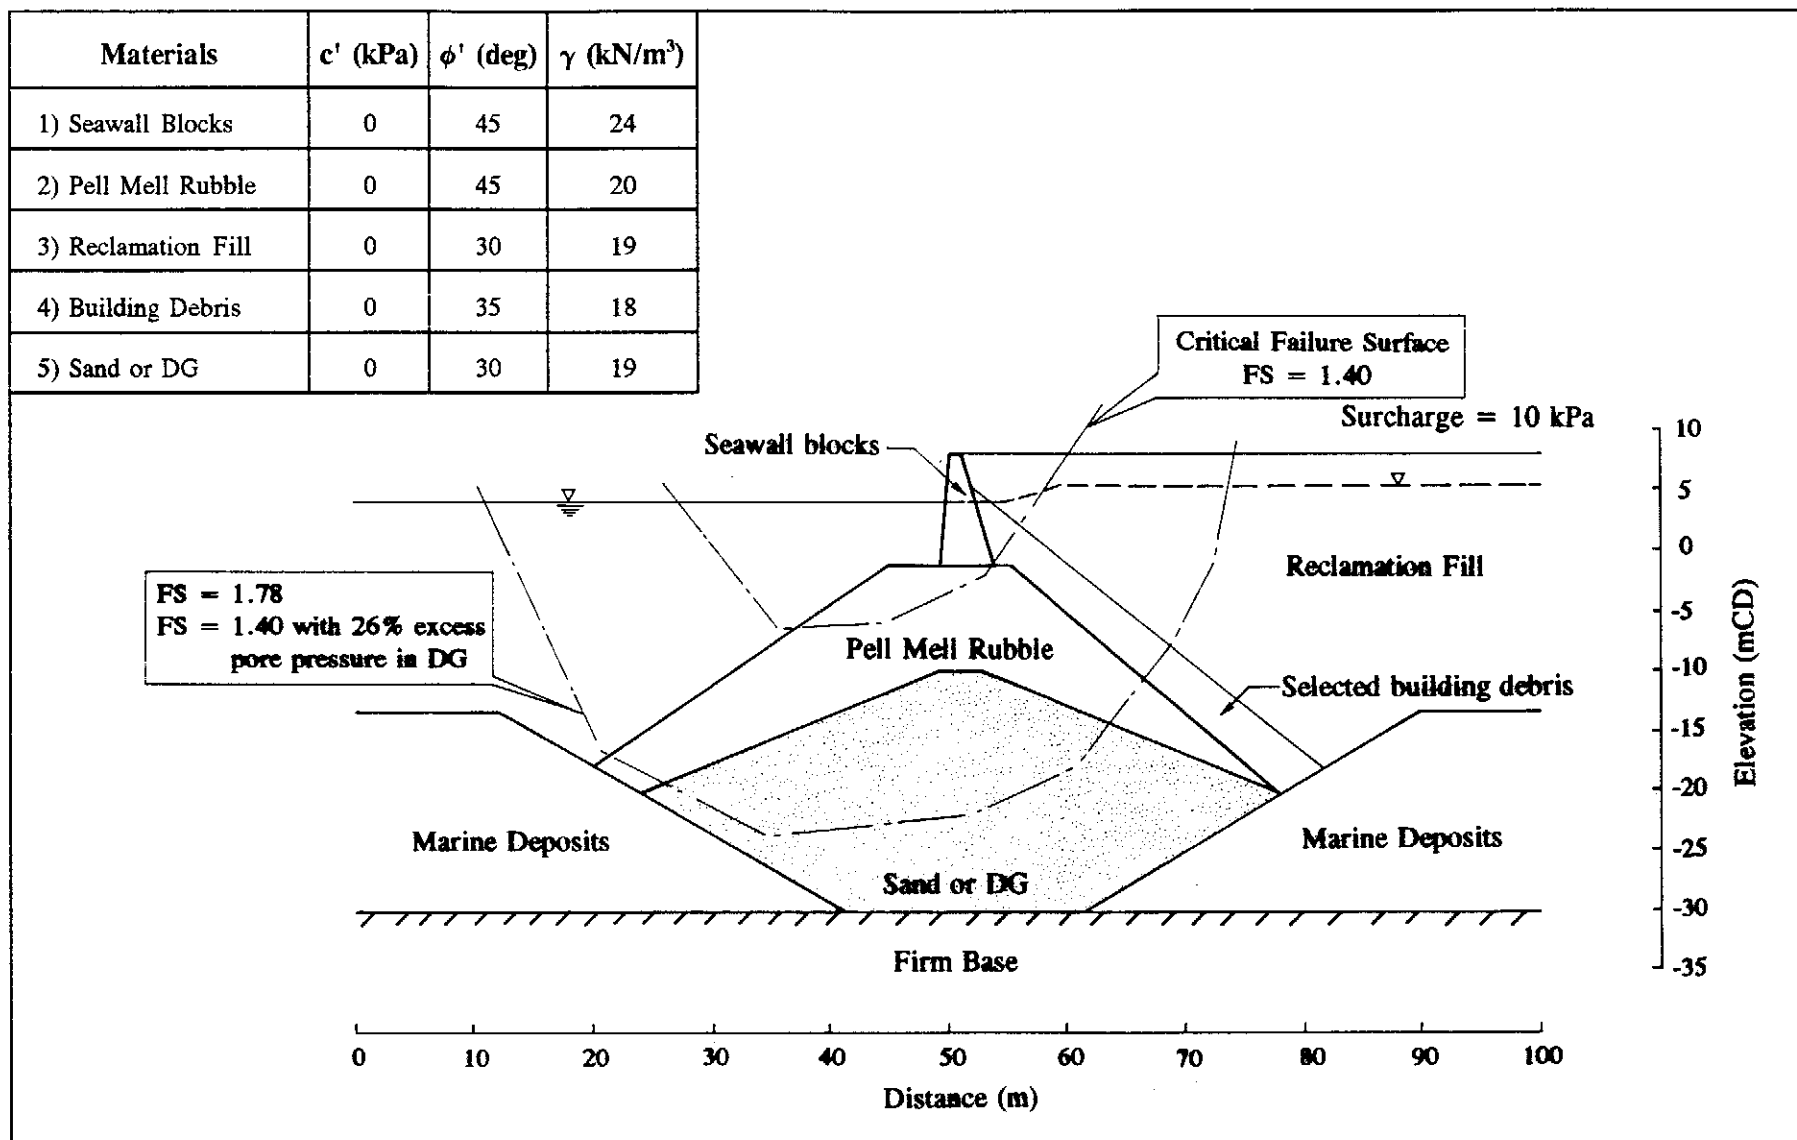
Stability Analyses of Seawall with 20 m Foundation Backfill
